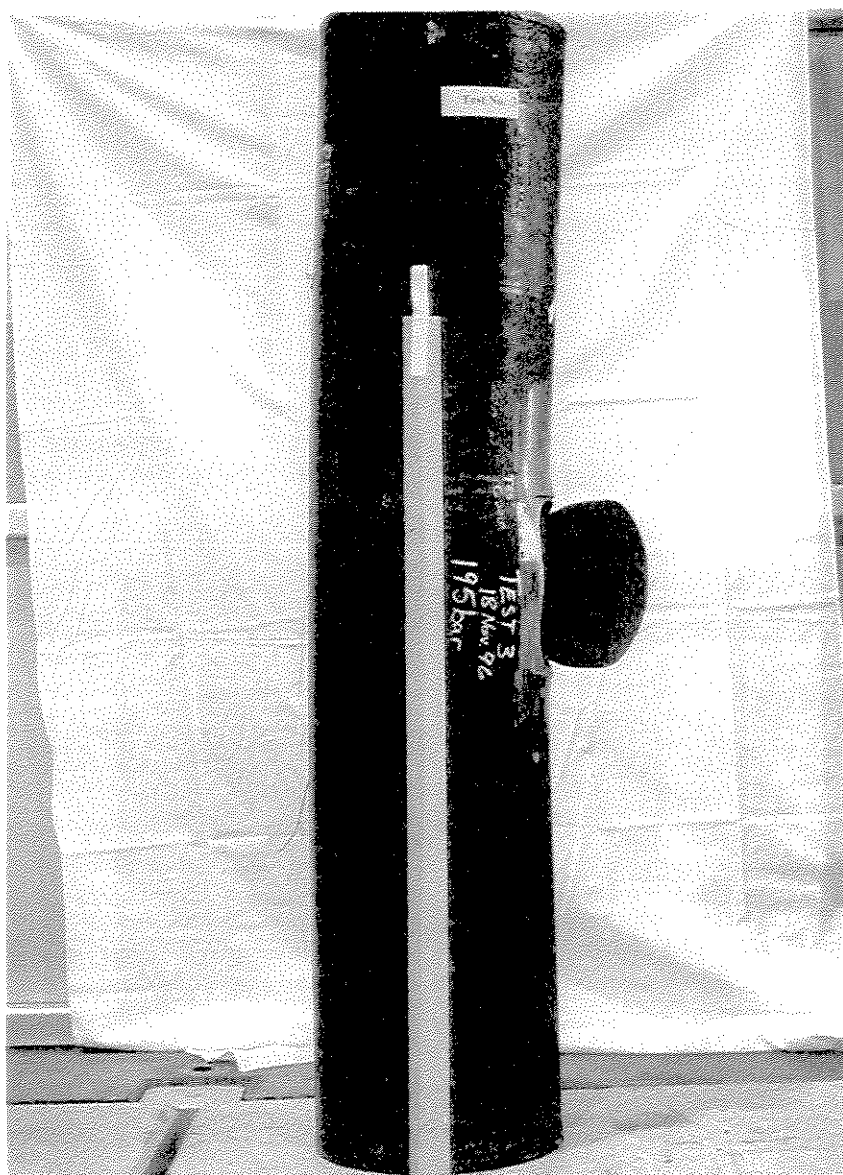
Picture of the test specimen no. 3 after the burst test
